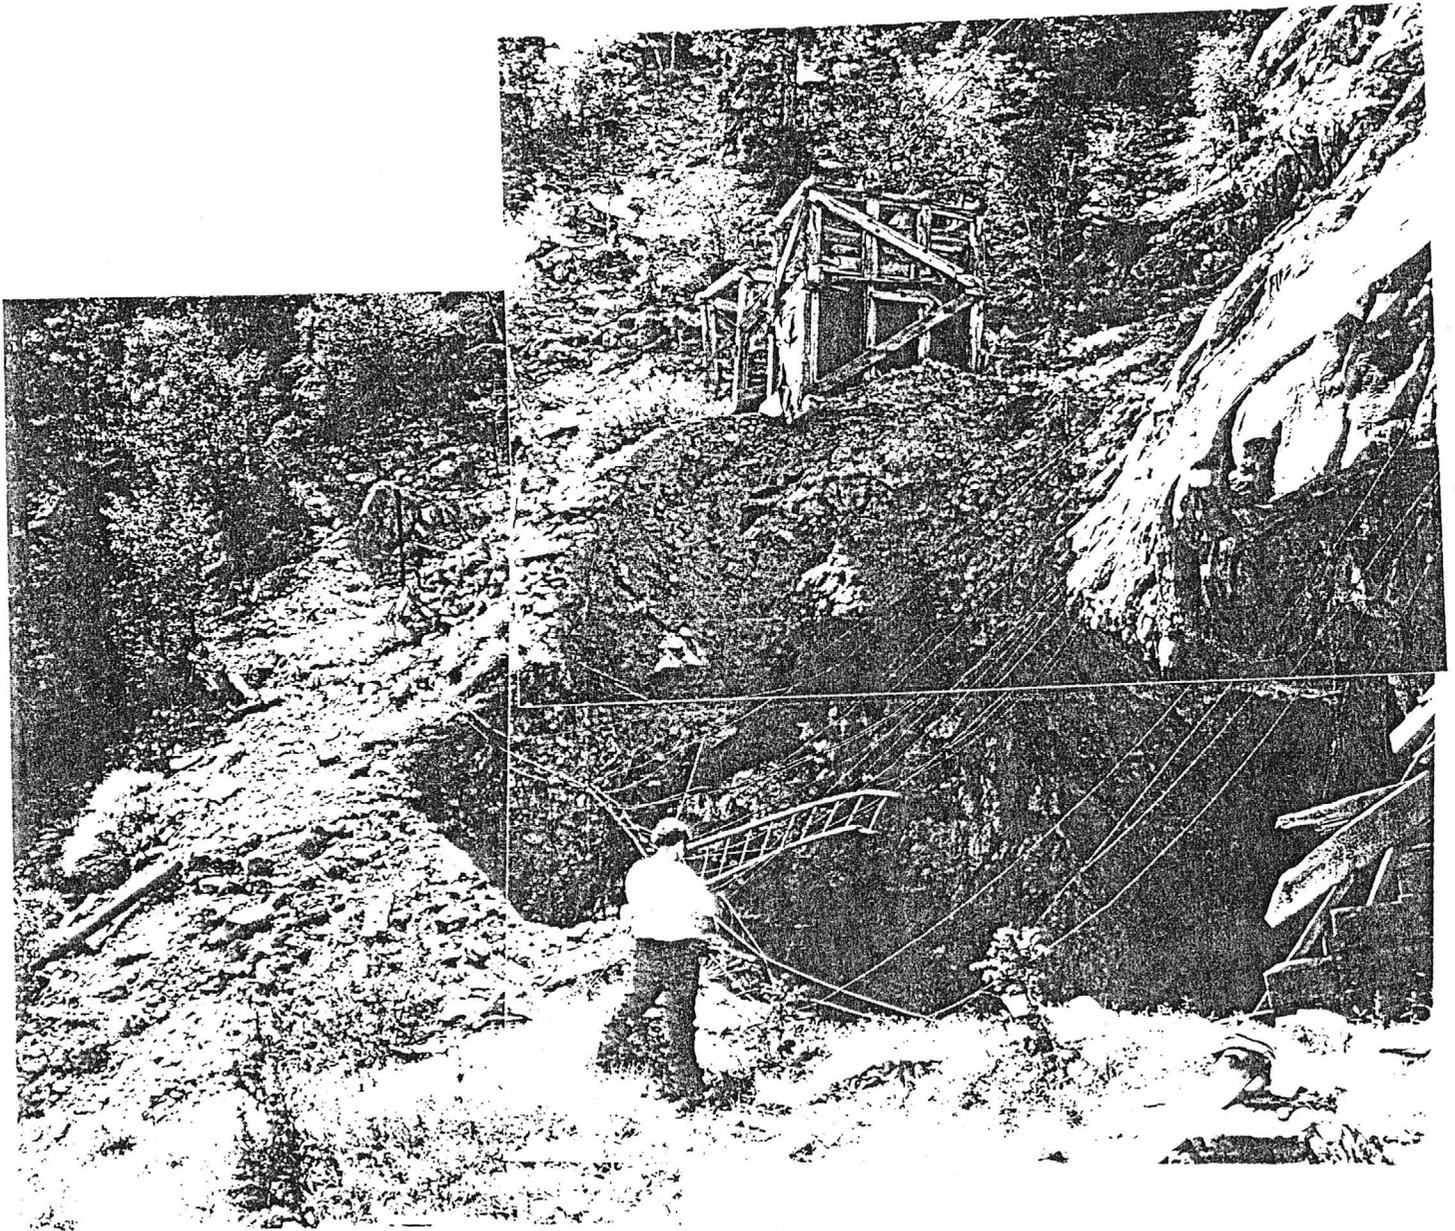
This photo is a closeup view of the open subsidence hole and low aerial tramway tower shown in Photo #4. The cables and wooden planks were an apparent attempt to isolate the open hole from men and equipment in the area.
